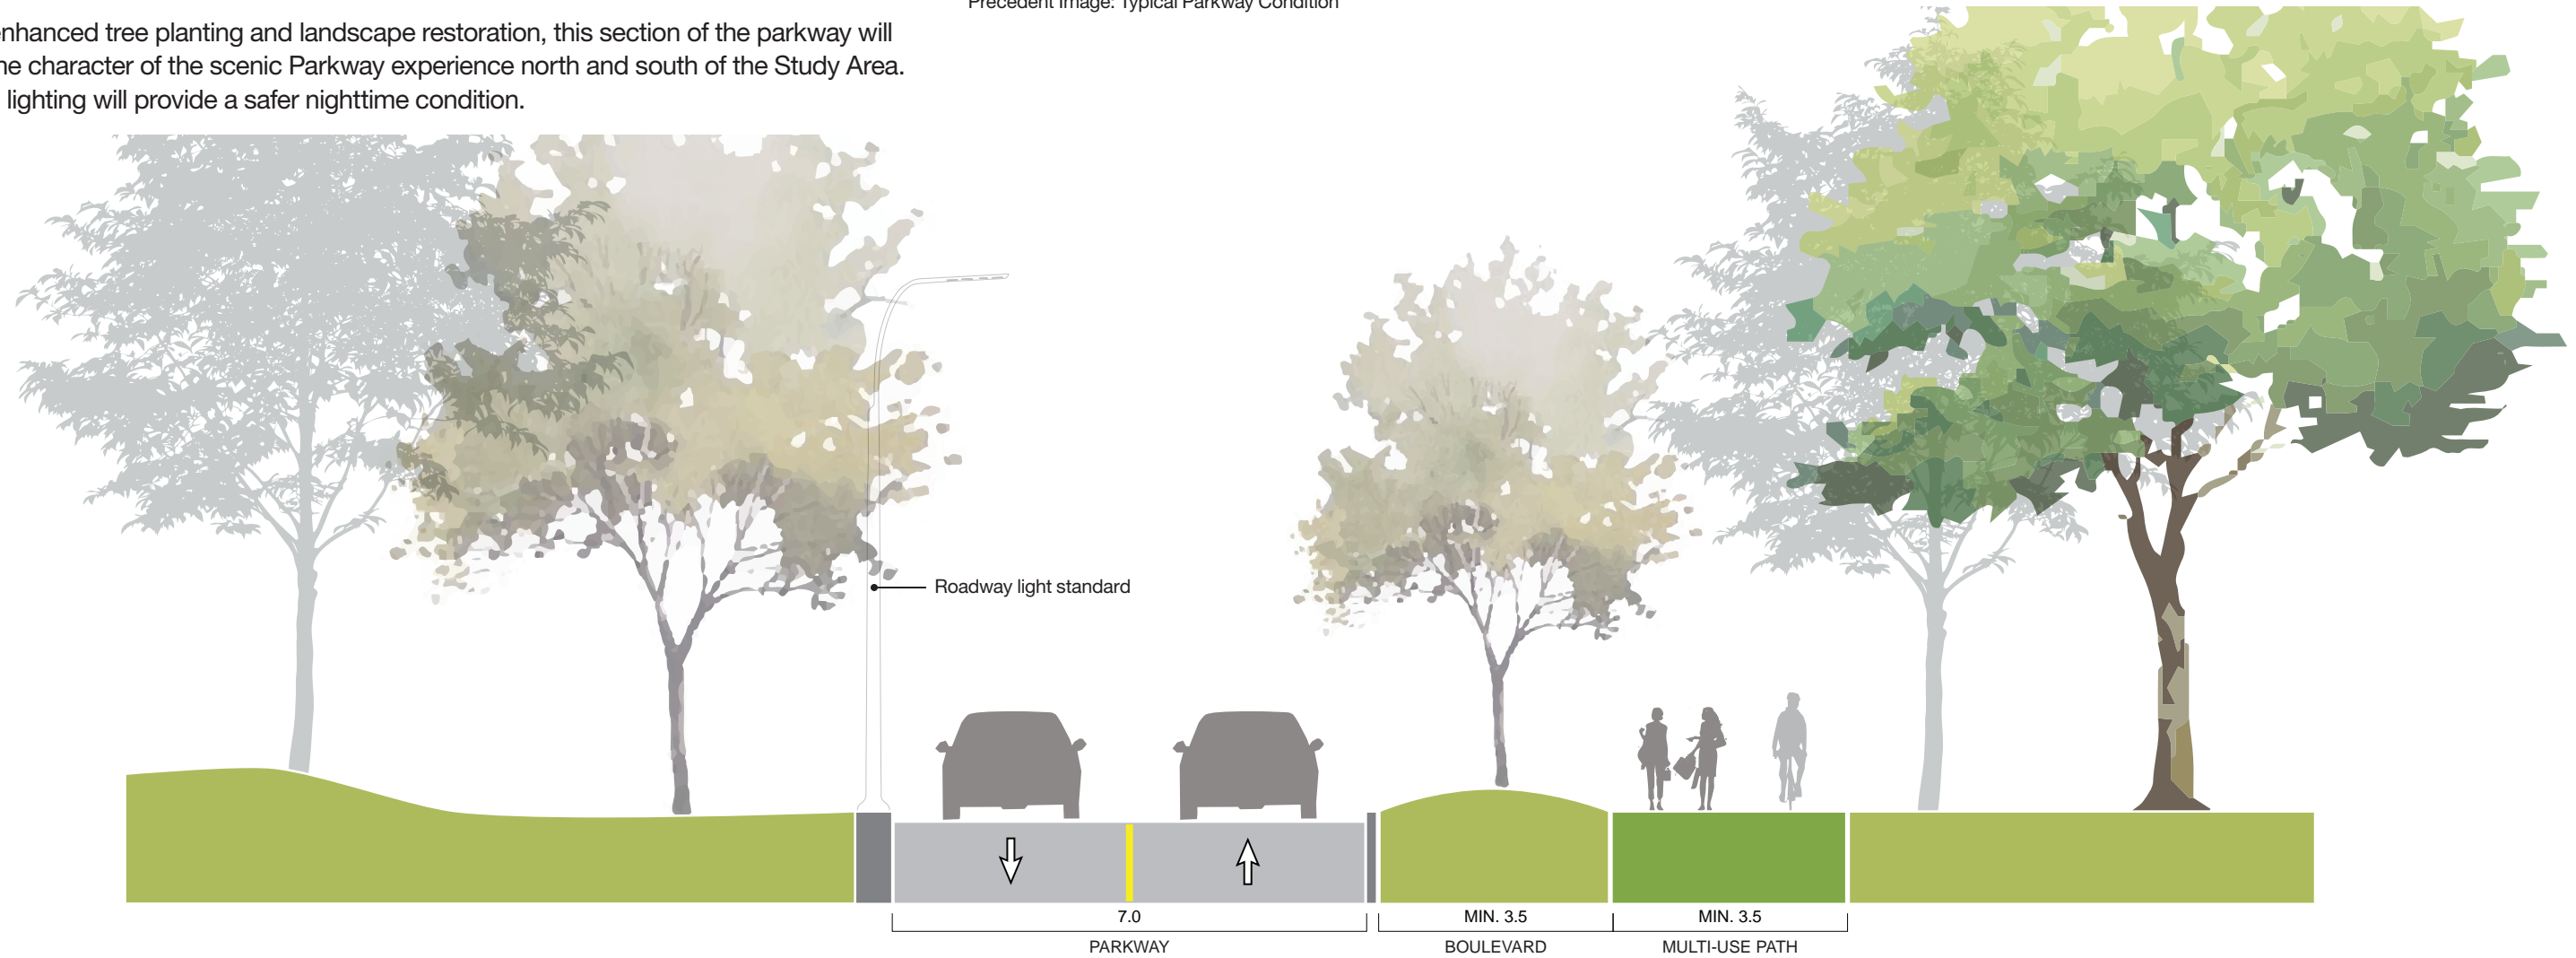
Parkway Section A: Portage to Upper Rapids (typical) - looking northward
